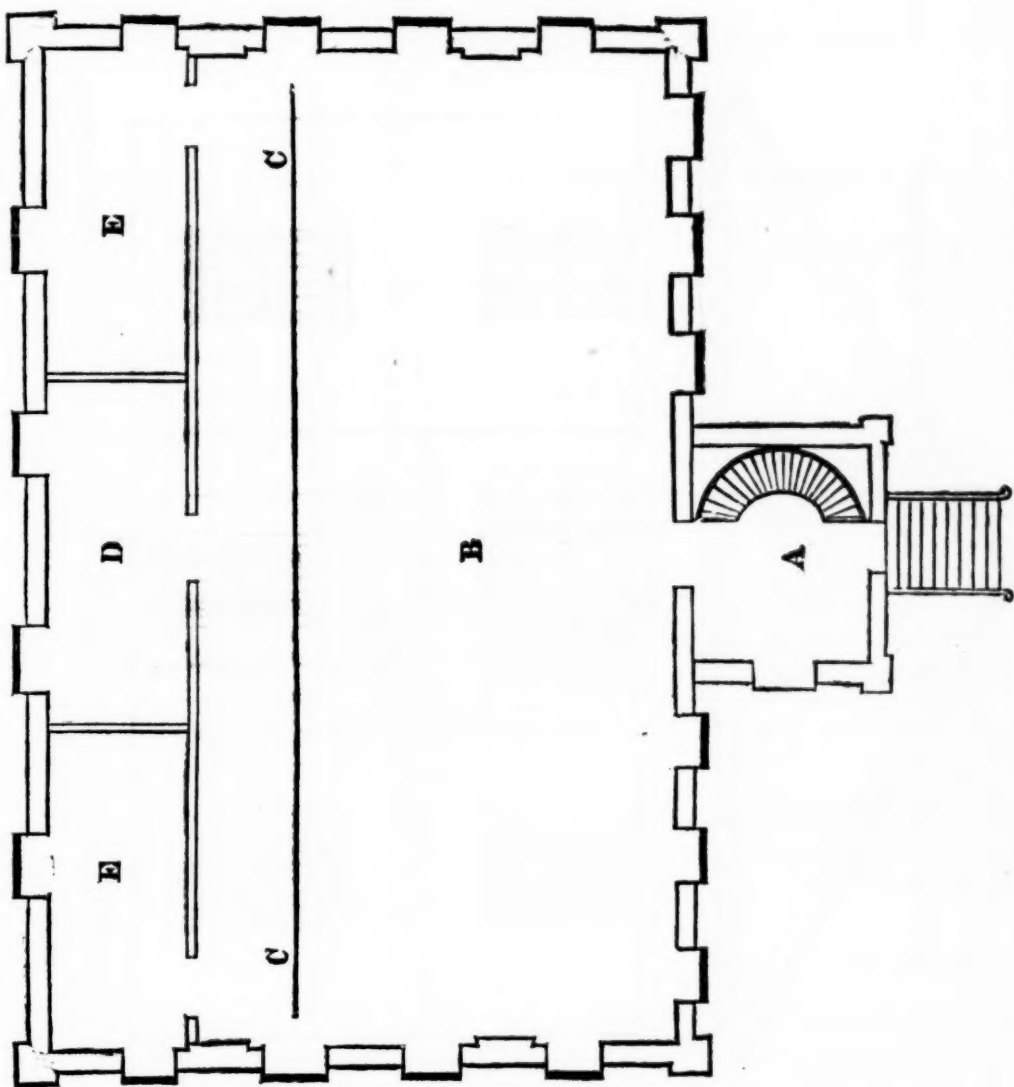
Plan of Lower Schoolroom.* Scale 1-16 inch to a foot.
